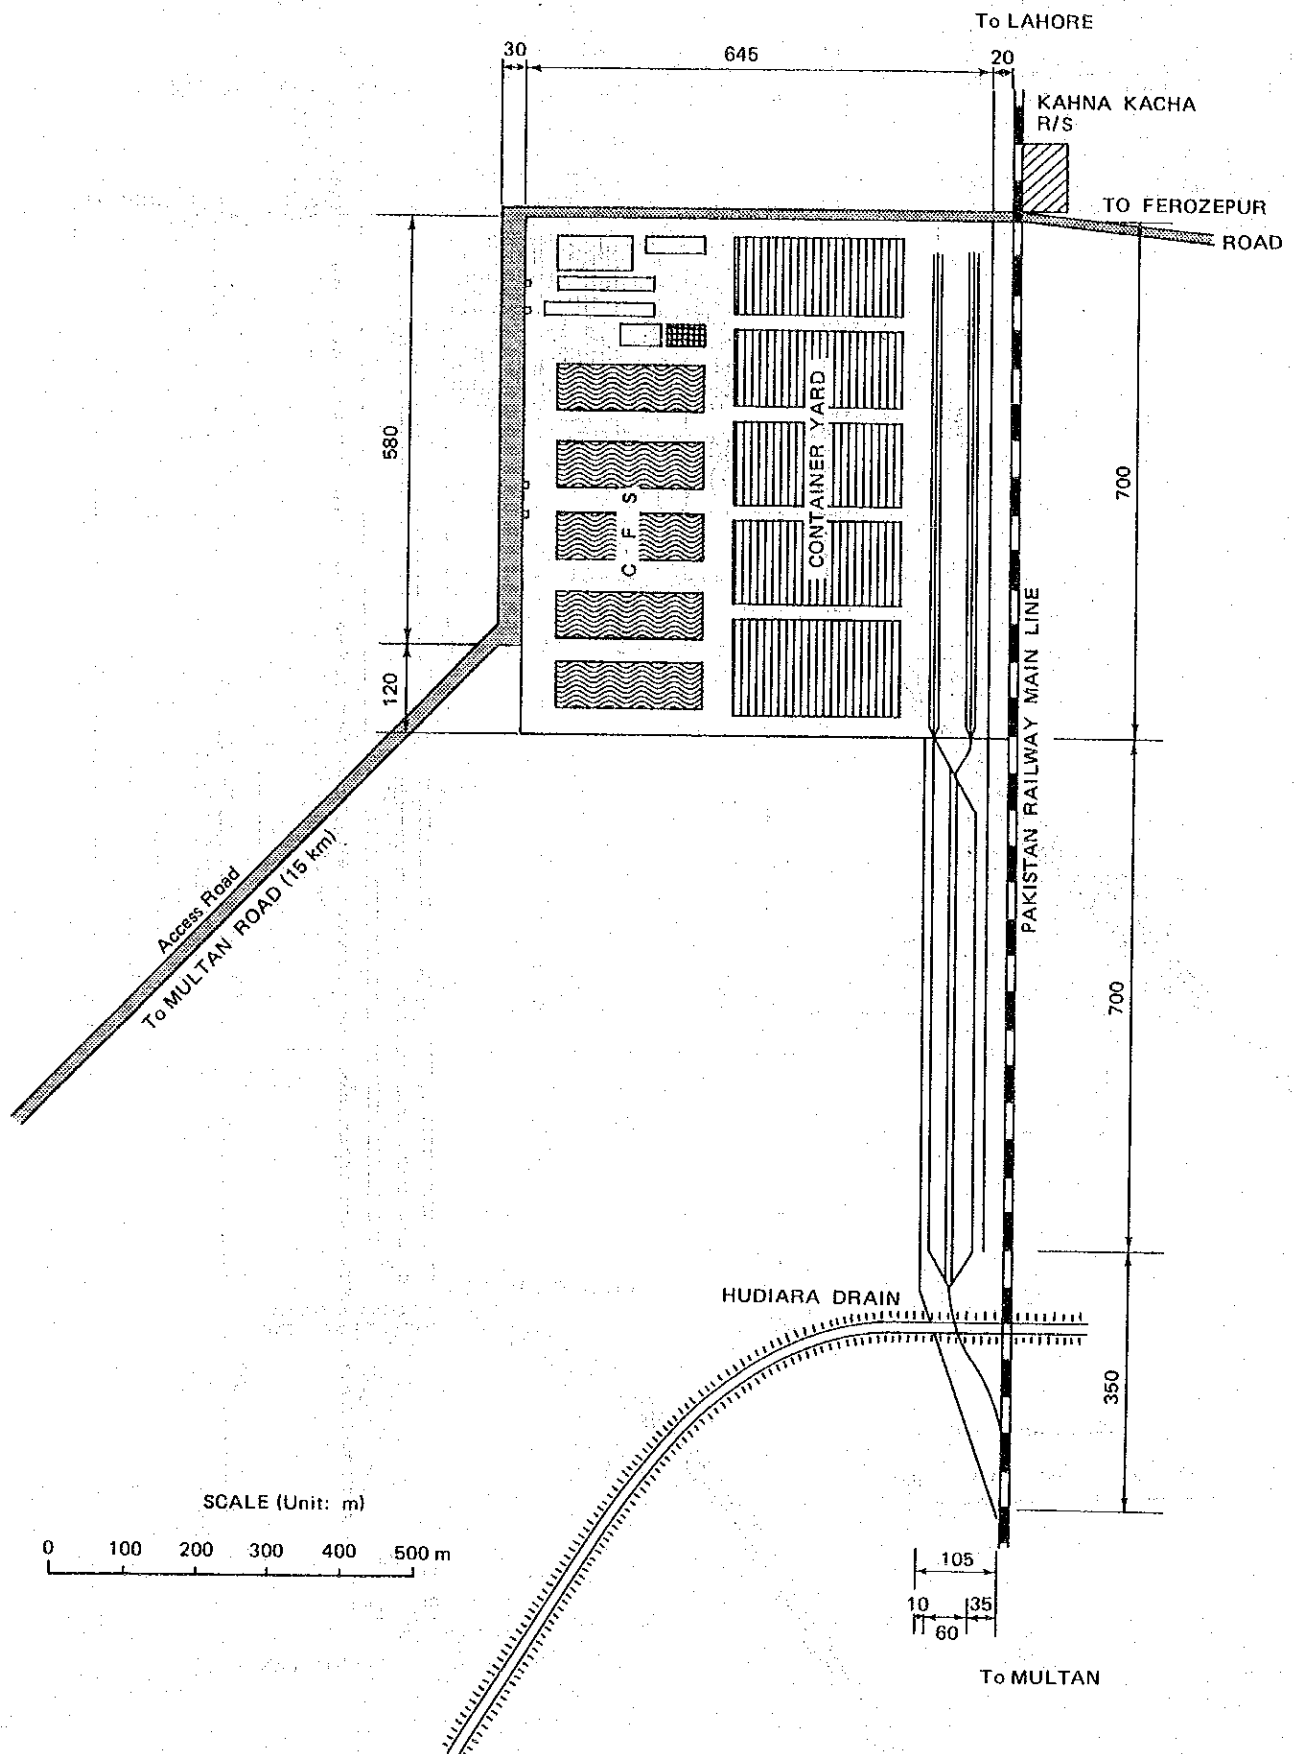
(2) Layout of Inland Container Freight Station (Urgent Plan)
